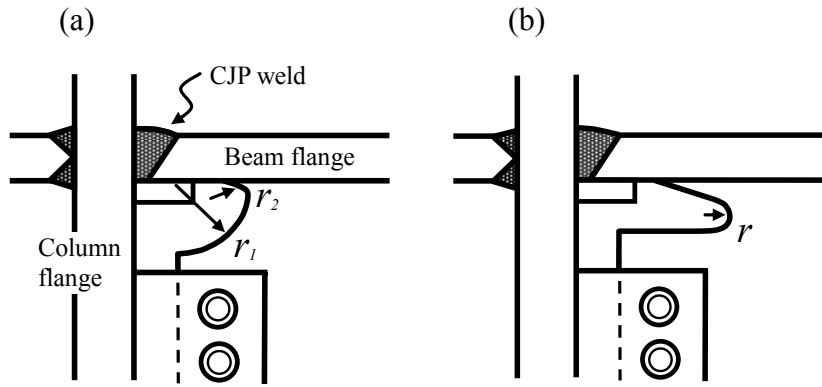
Weld access hole configurations: (a) a quarter-circular shape; (b) a modified shape recommended by FEMA-350.
